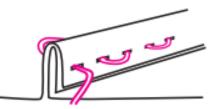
Sketch showing rope fixing by cutting a hole without or outside a reinforcement band ²⁷⁴
